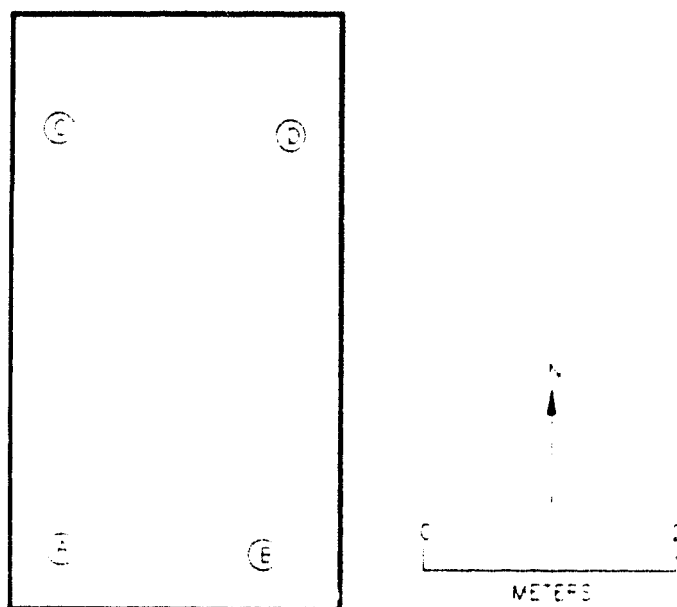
Floor Plan of the Emergency Generator Building Showing Survey Locations
